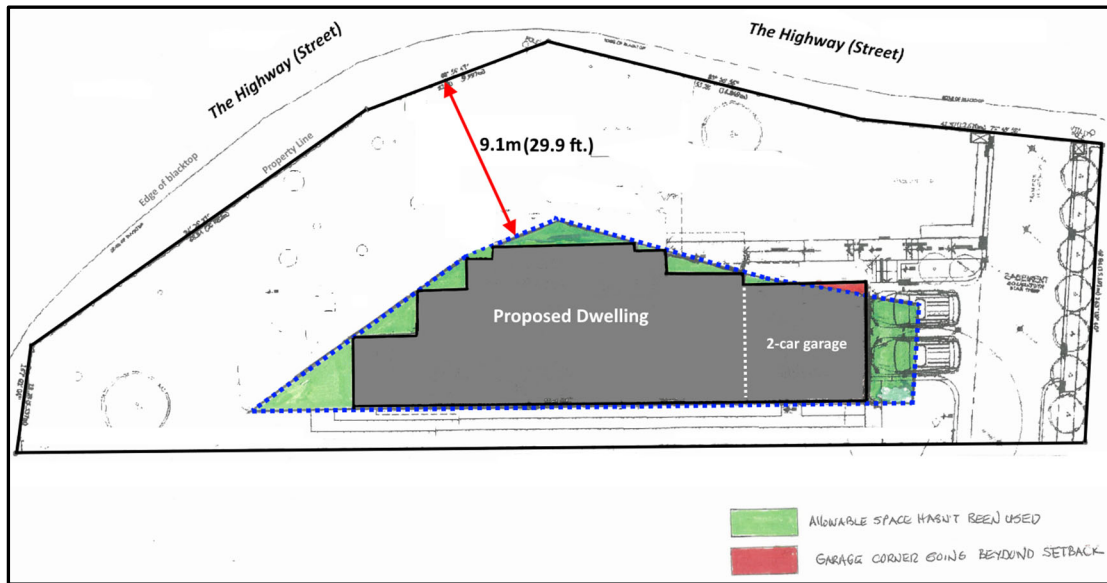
Site plan (Allowable building envelope in dotted blue)
